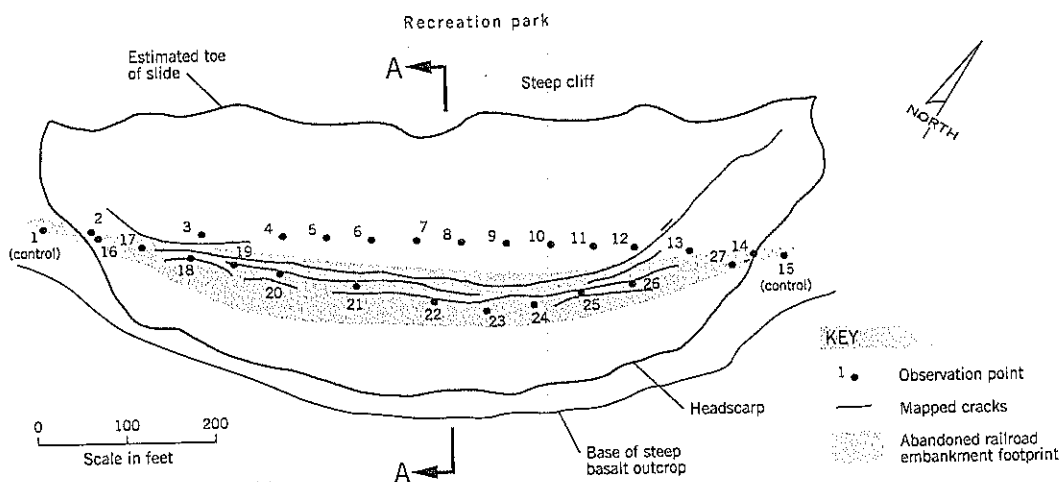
Pelton Upper Slide. Site plan showing old railroad embankment, ground cracks, and survey points of the 1975 landslide.
